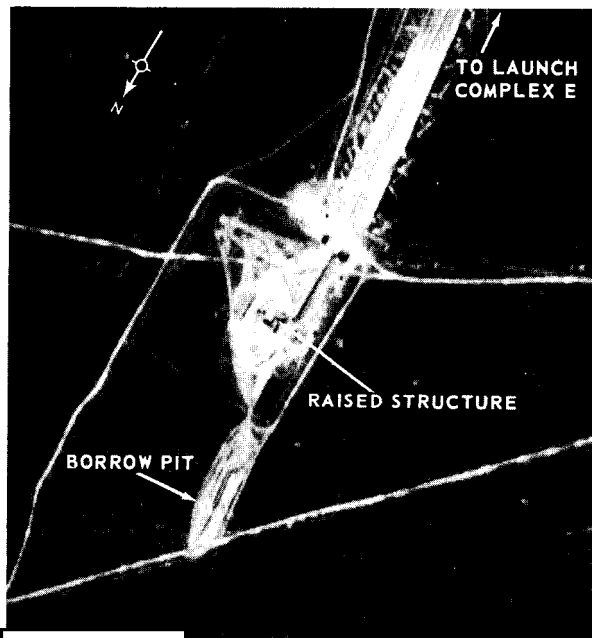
NEW CONSTRUCTION NORTH OF LAUNCH COMPLEX E, KAPUSTIN YAR.
